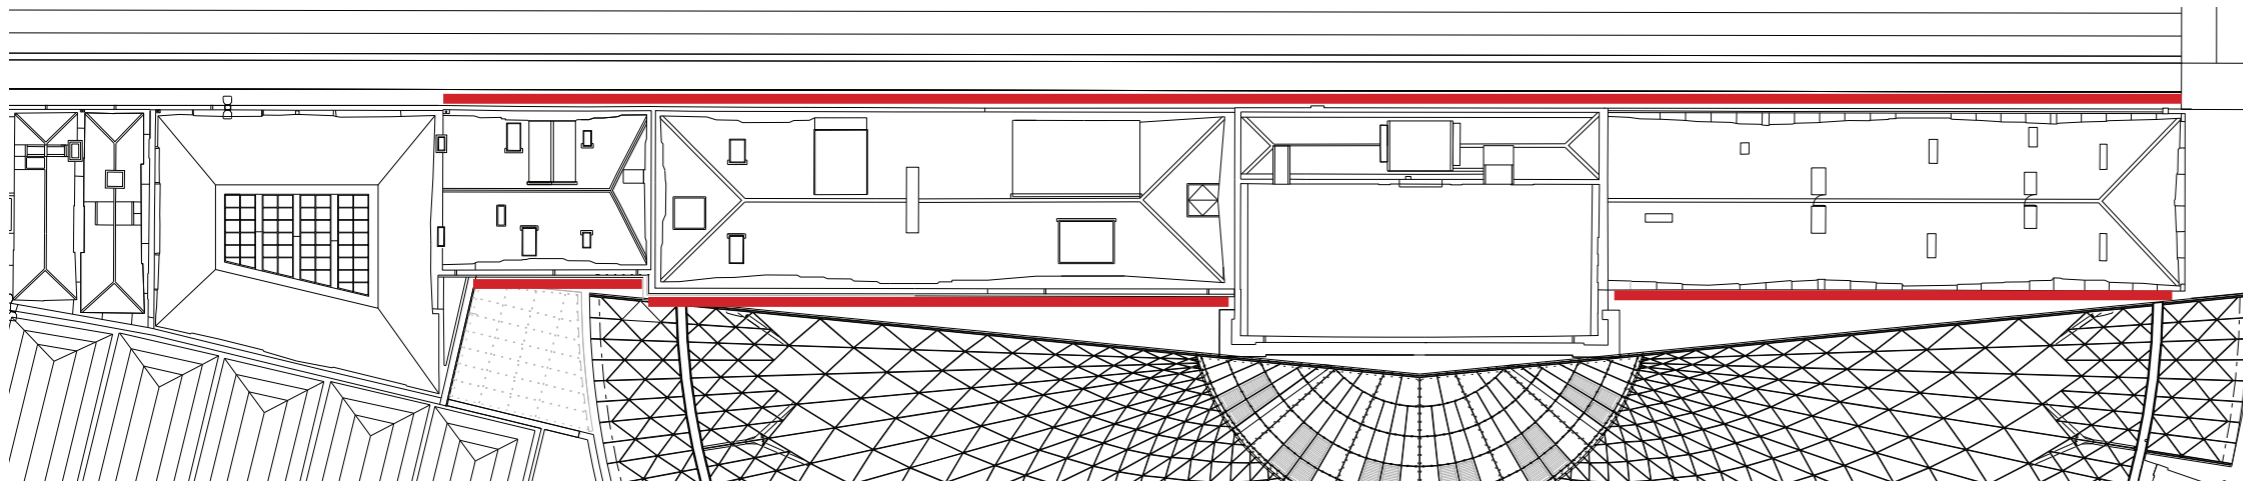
Western Range windows where safety railings are consented adjacent to gutter walkways
